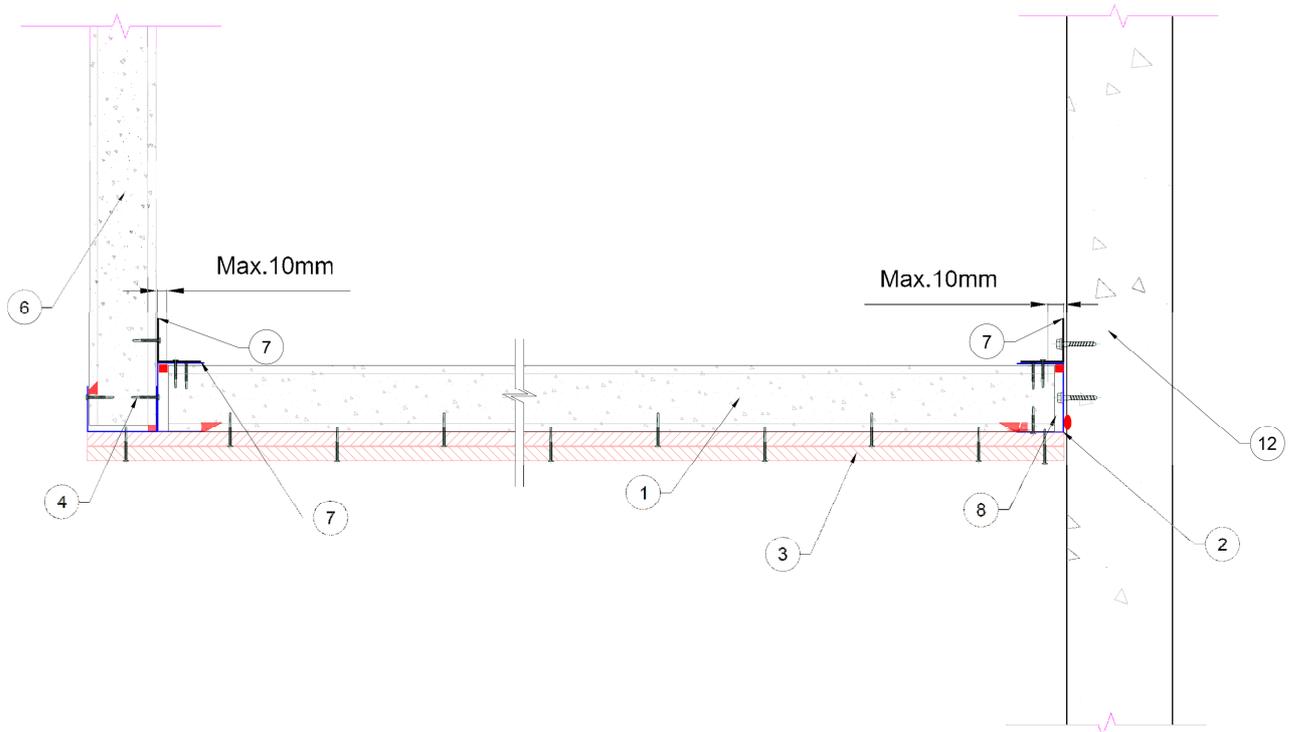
Speedpanel bulkhead ceiling span protected with plasterboard linings
